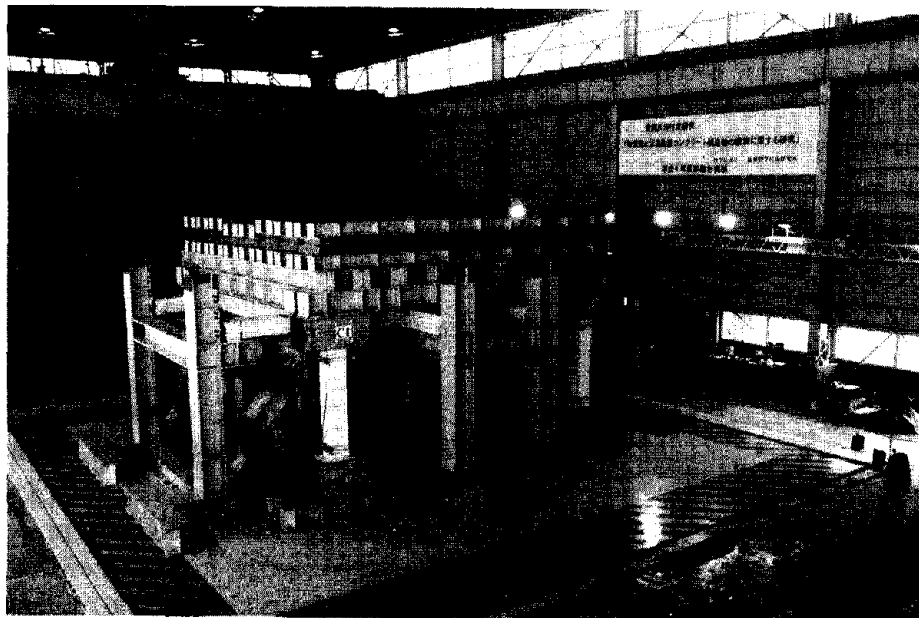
Actual Size 1-stoty Reinforced Concrete Specimen
